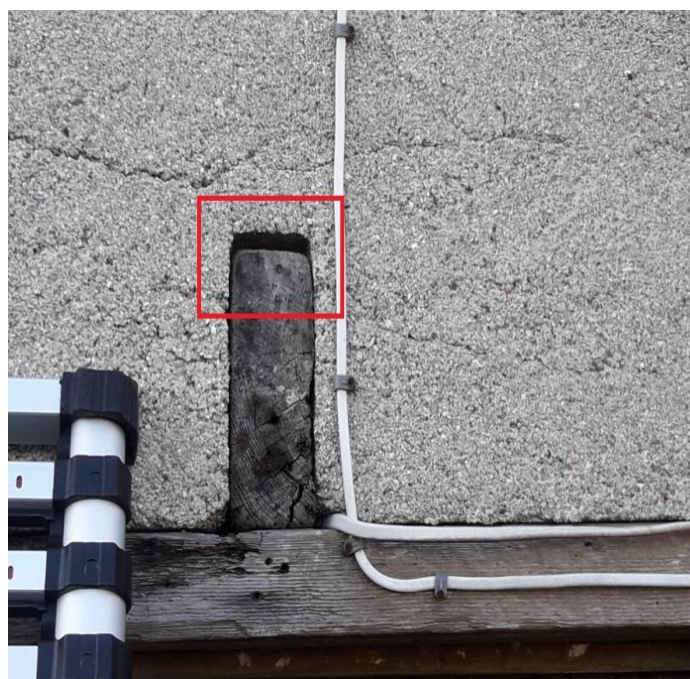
Gap above 1<sup>st</sup> floor roof joist
